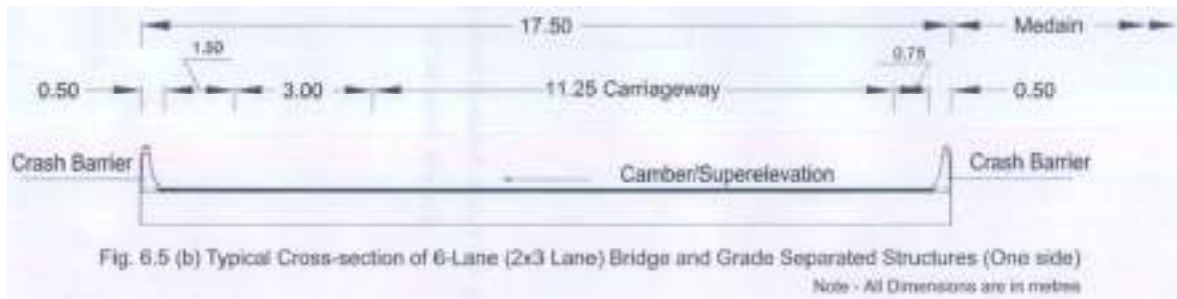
Cross Section of New Bridge at Deck Level for 6 Lanes
